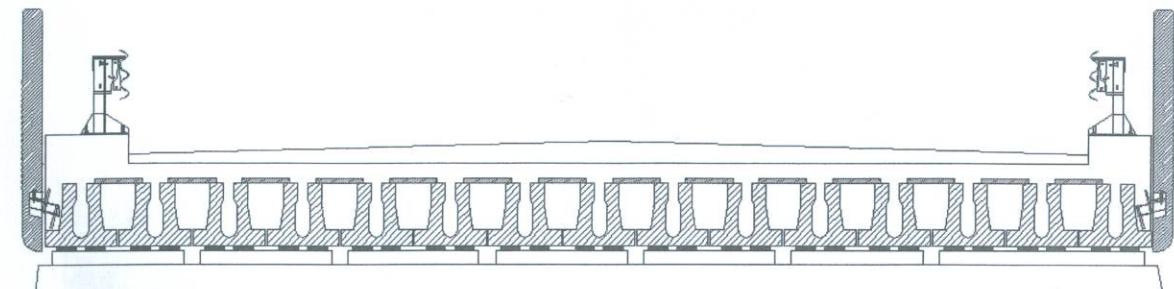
Precast slab bridge with cast in-situ infill
